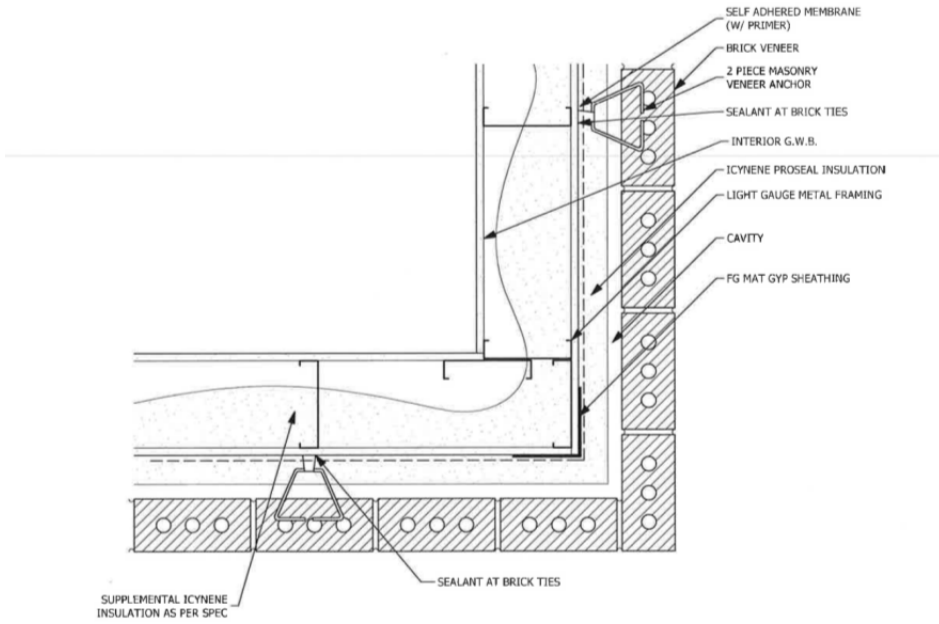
"Icynene ProSeal Air Barrier System" outside corner detail
